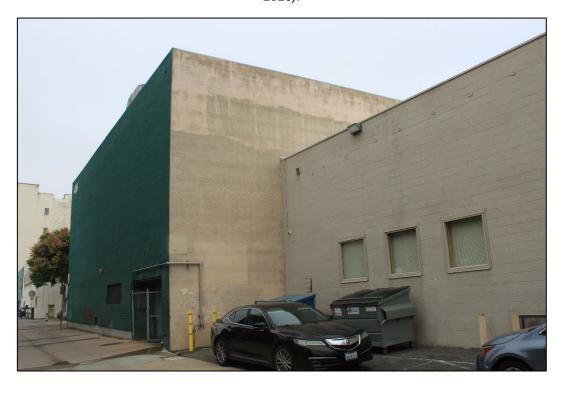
Rear of 887 Fulton Street on Homerun Alley, at left, facing north (Stantec, 2025).
